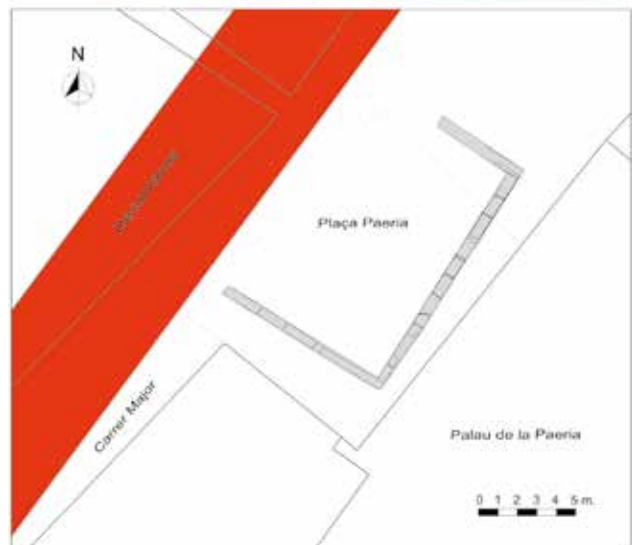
Detail of the foundations and plan of the possible port warehouse.
